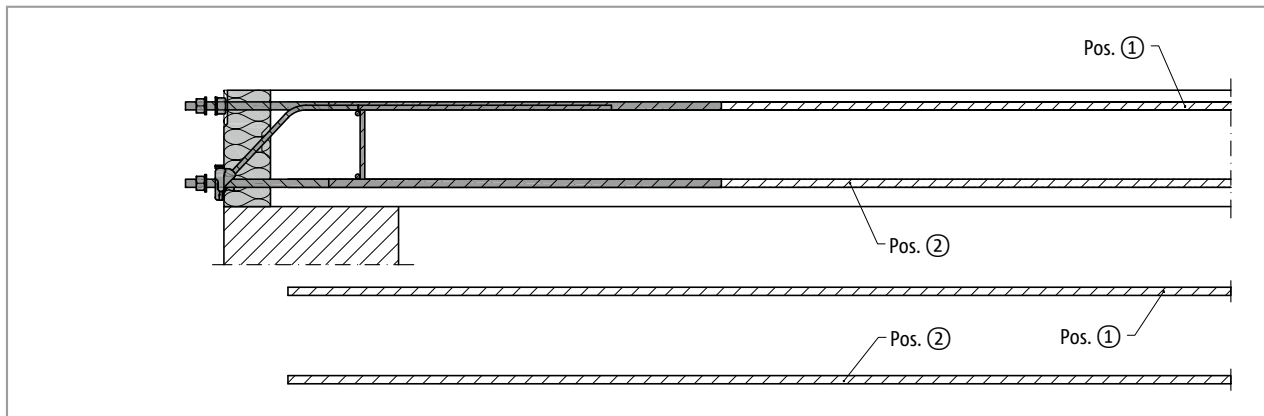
Schöck Isokorb® T type SK-MM1-VV1: On-site reinforcement: Cross section
